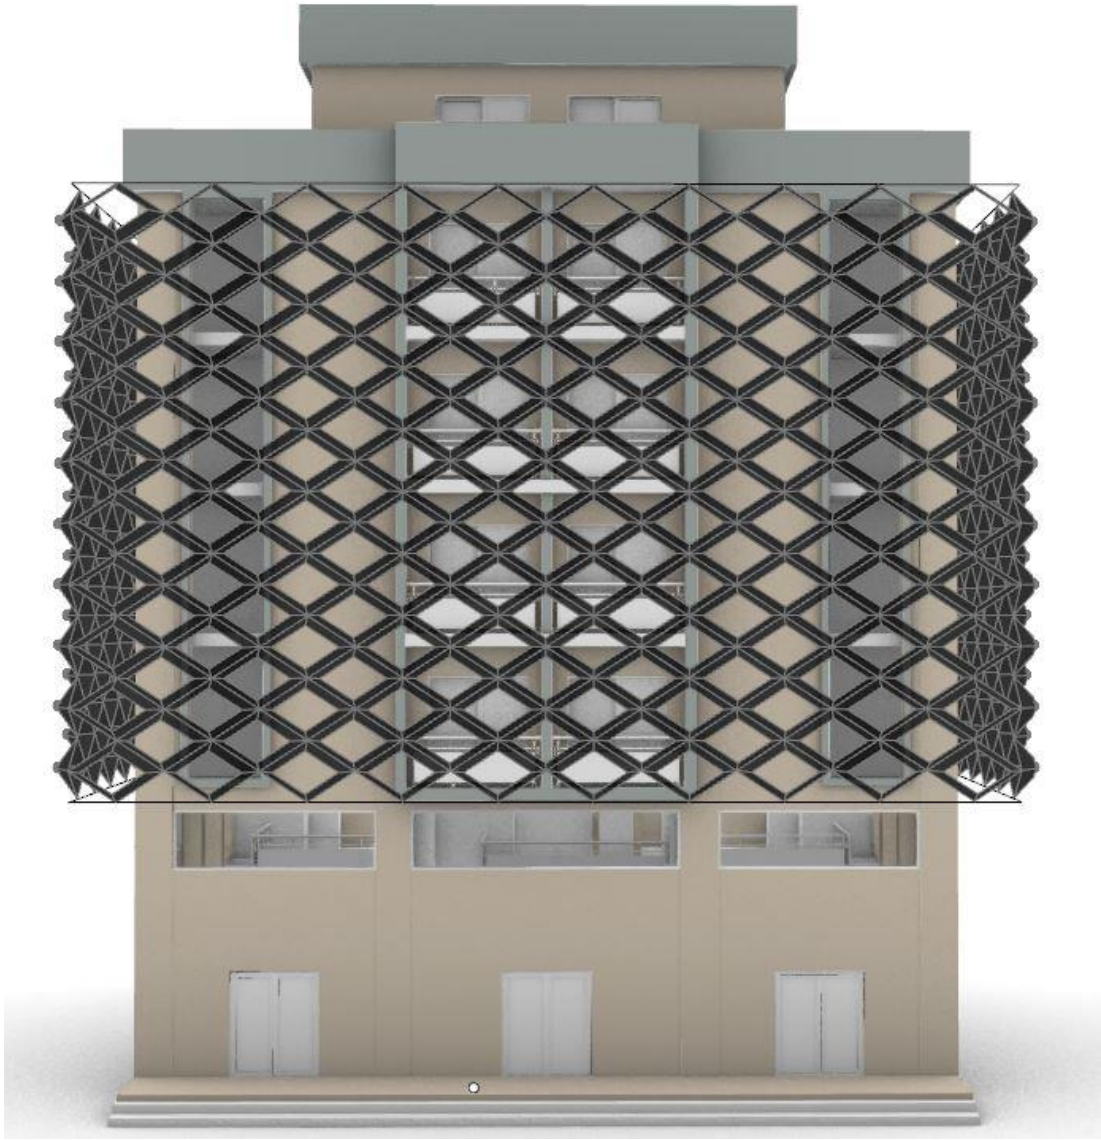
3D visualization of the Diamond form façade elements surrounding the building fully expanded (Author, 2023)
